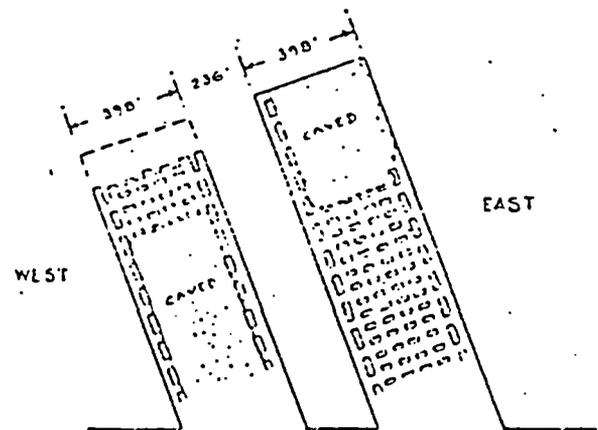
Layout of the test panels. Depth from surface, 550-650 ft. Main headings, 28 ft wide. Crosscuts, 32 ft wide. Pillar height, 6½ ft. Pillars within the panels, 14 x 38 ft. Extraction within the panels, 82%. Pillar strength, 8700 psi. Pillar load, 4350 psi. Nominal pillar safety factor, 2.0.
